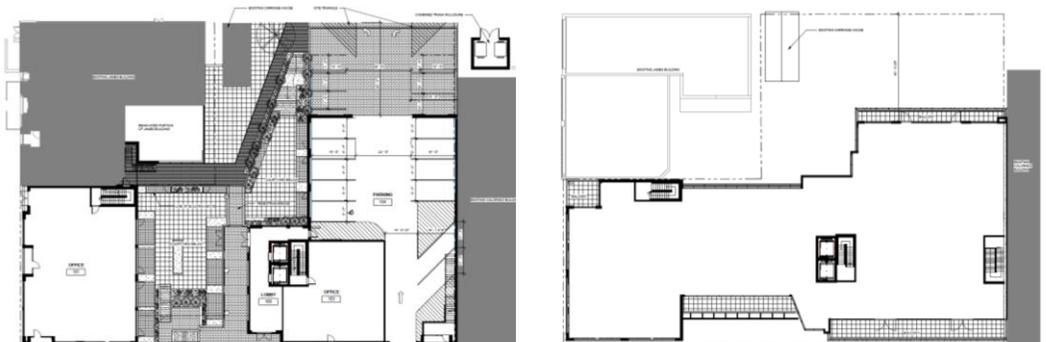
First Floor and Ground Level Plan on left, Fourth Floor Plan on right
